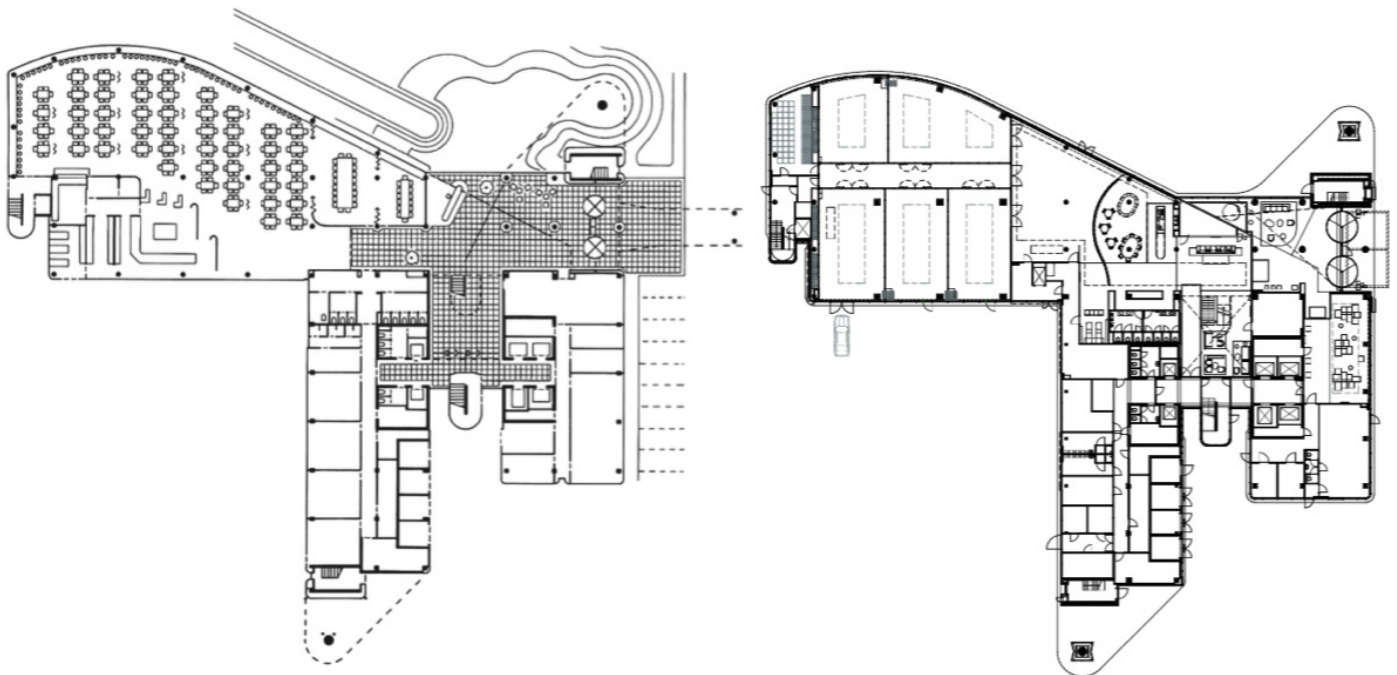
Floor plans Old and new situation ([www.gebouwddin.amsterdam.nl](http://www.gebouwddin.amsterdam.nl))
